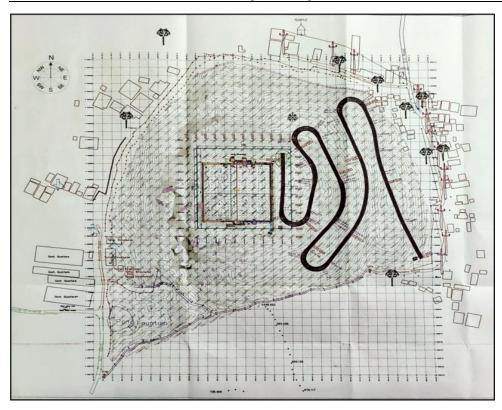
Plan view of the proposed GLSR showing different structures at the foothill
